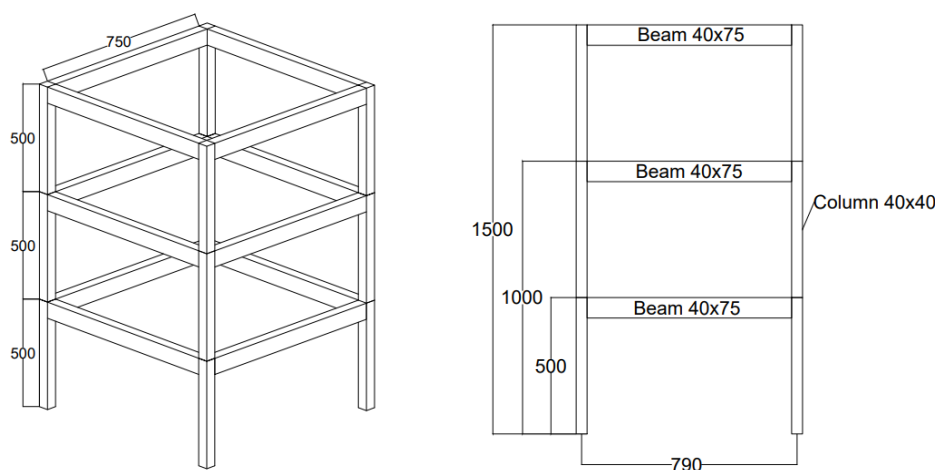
2: 3D view of concrete modelled in AutoCAD.
